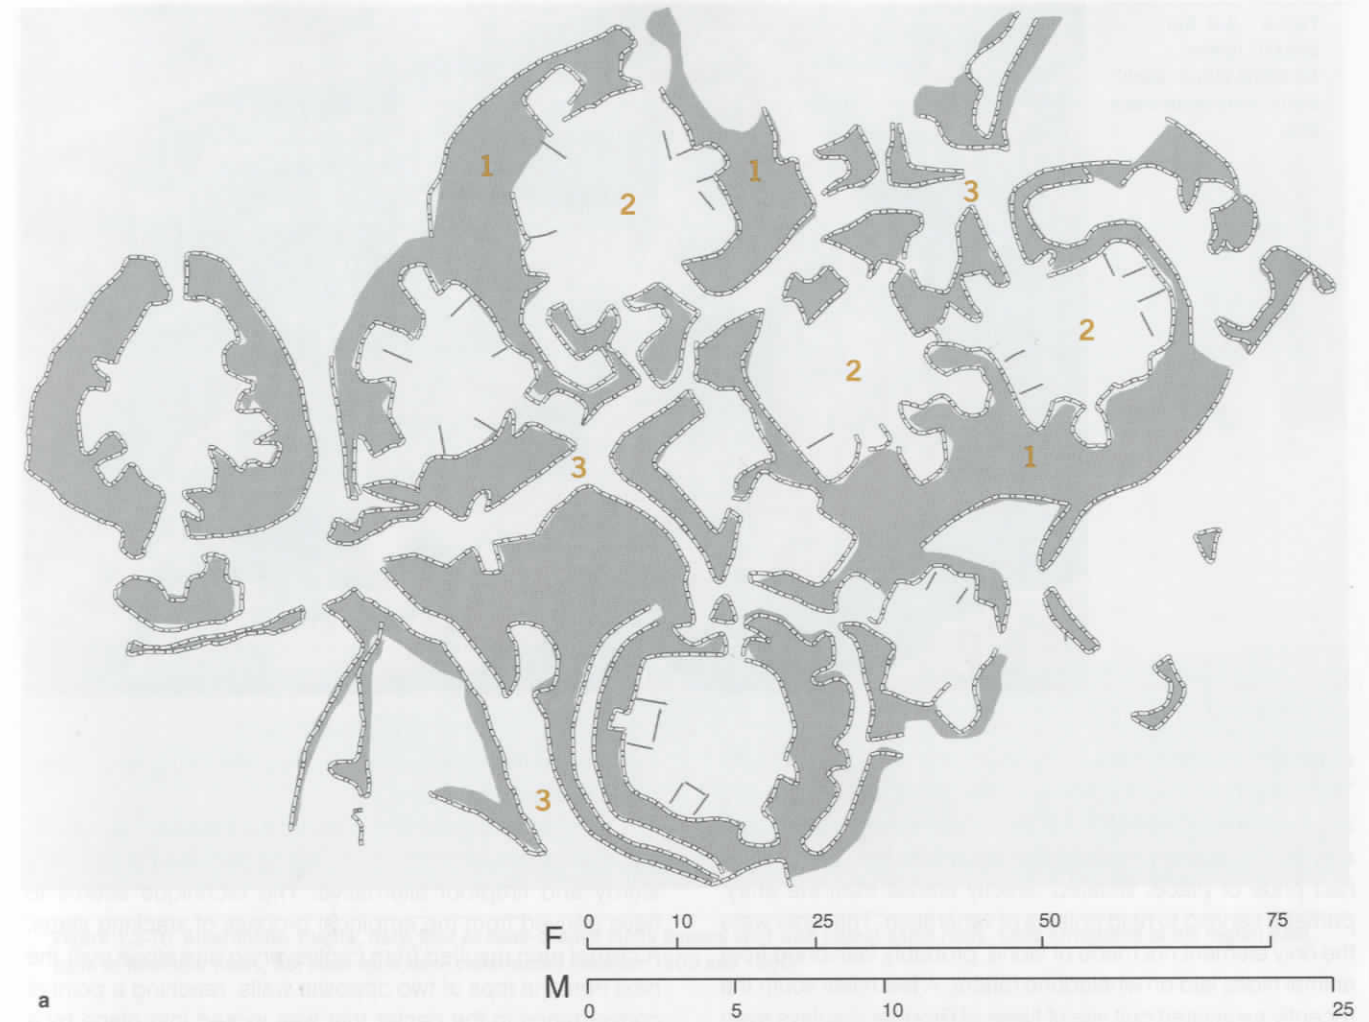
Orkney Islands, Scotland. Skara Brae, ca. 3000 BCE. (a) Plan, showing (1) thick walls built of dry-wall masonry, (2) individual lodgings featuring built-in furnishings made from stone slabs, and (3) narrow paths connecting the dwellings as a community. (b) Dry-wall masonry from brick-sized stones.
